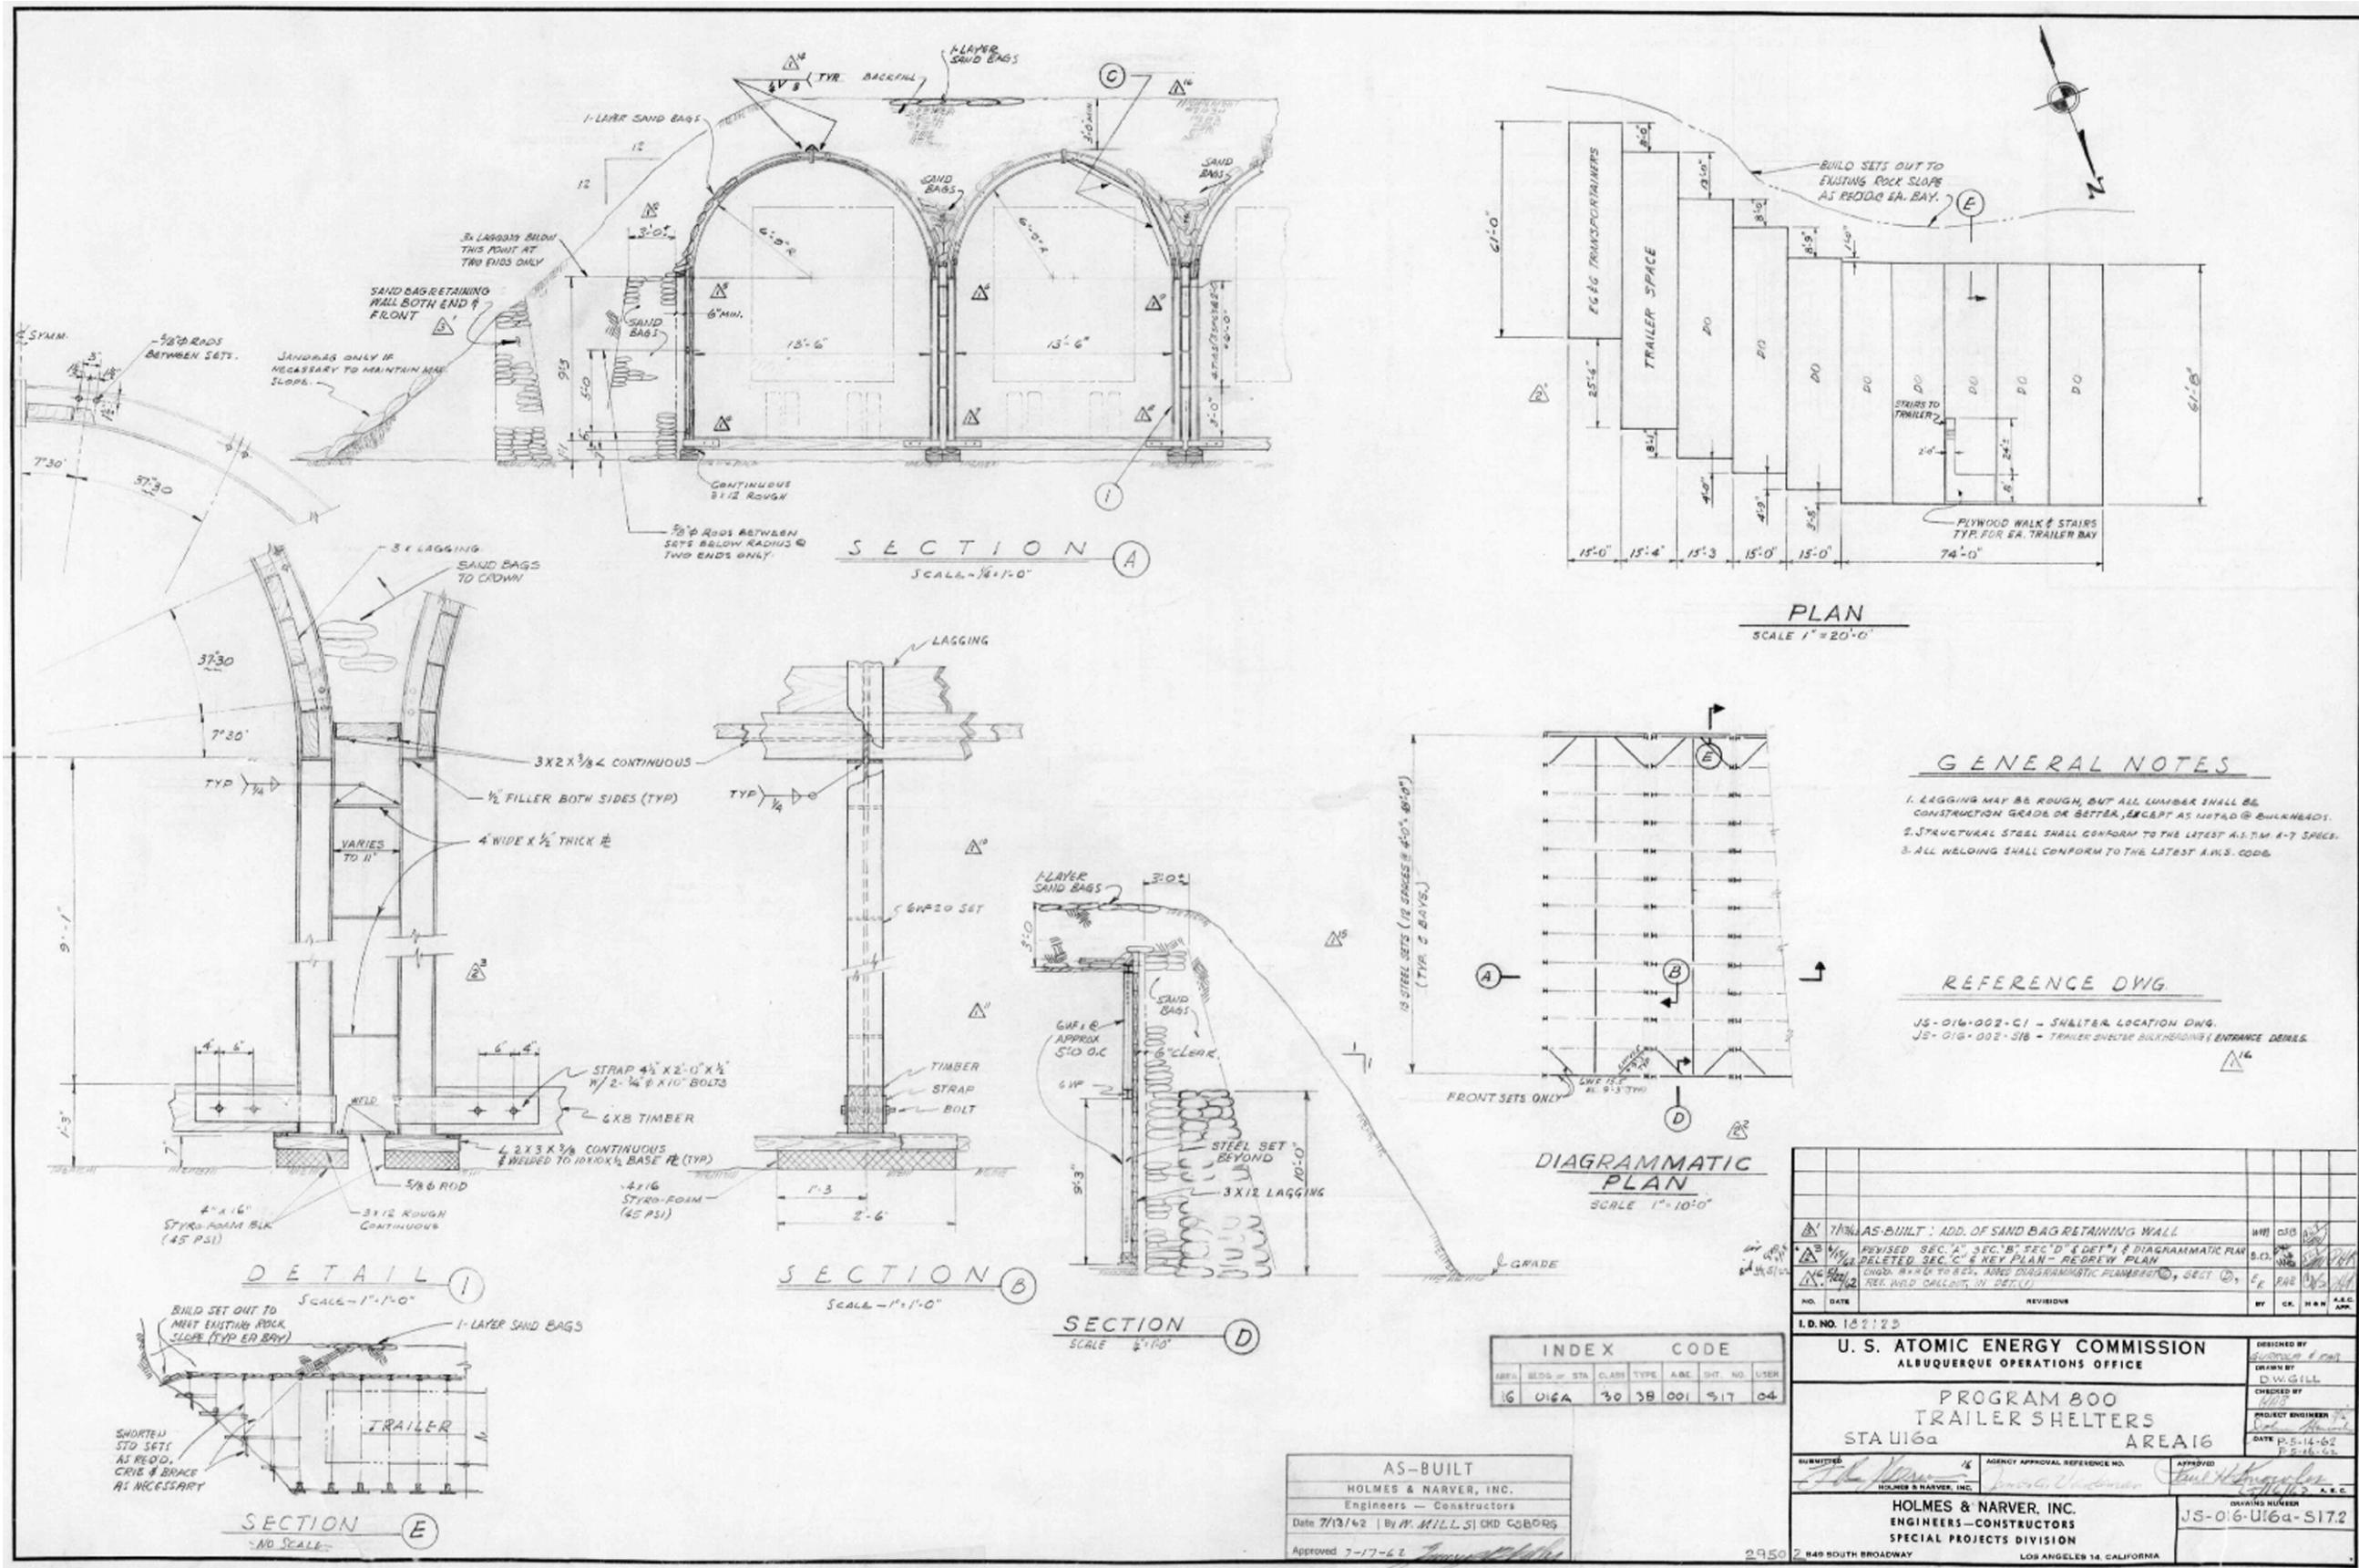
U16a Tunnel trailer park, Ft. Morgan, trailer shelters construction (1962 - on file at DOE Archives and Records Center).
